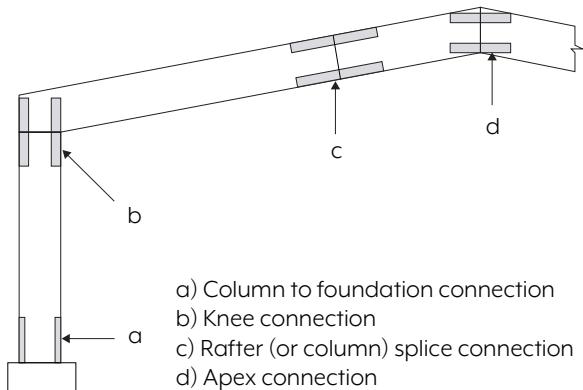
Applications of the Quick-Connect Moment Connection in Portal Frame Construction
